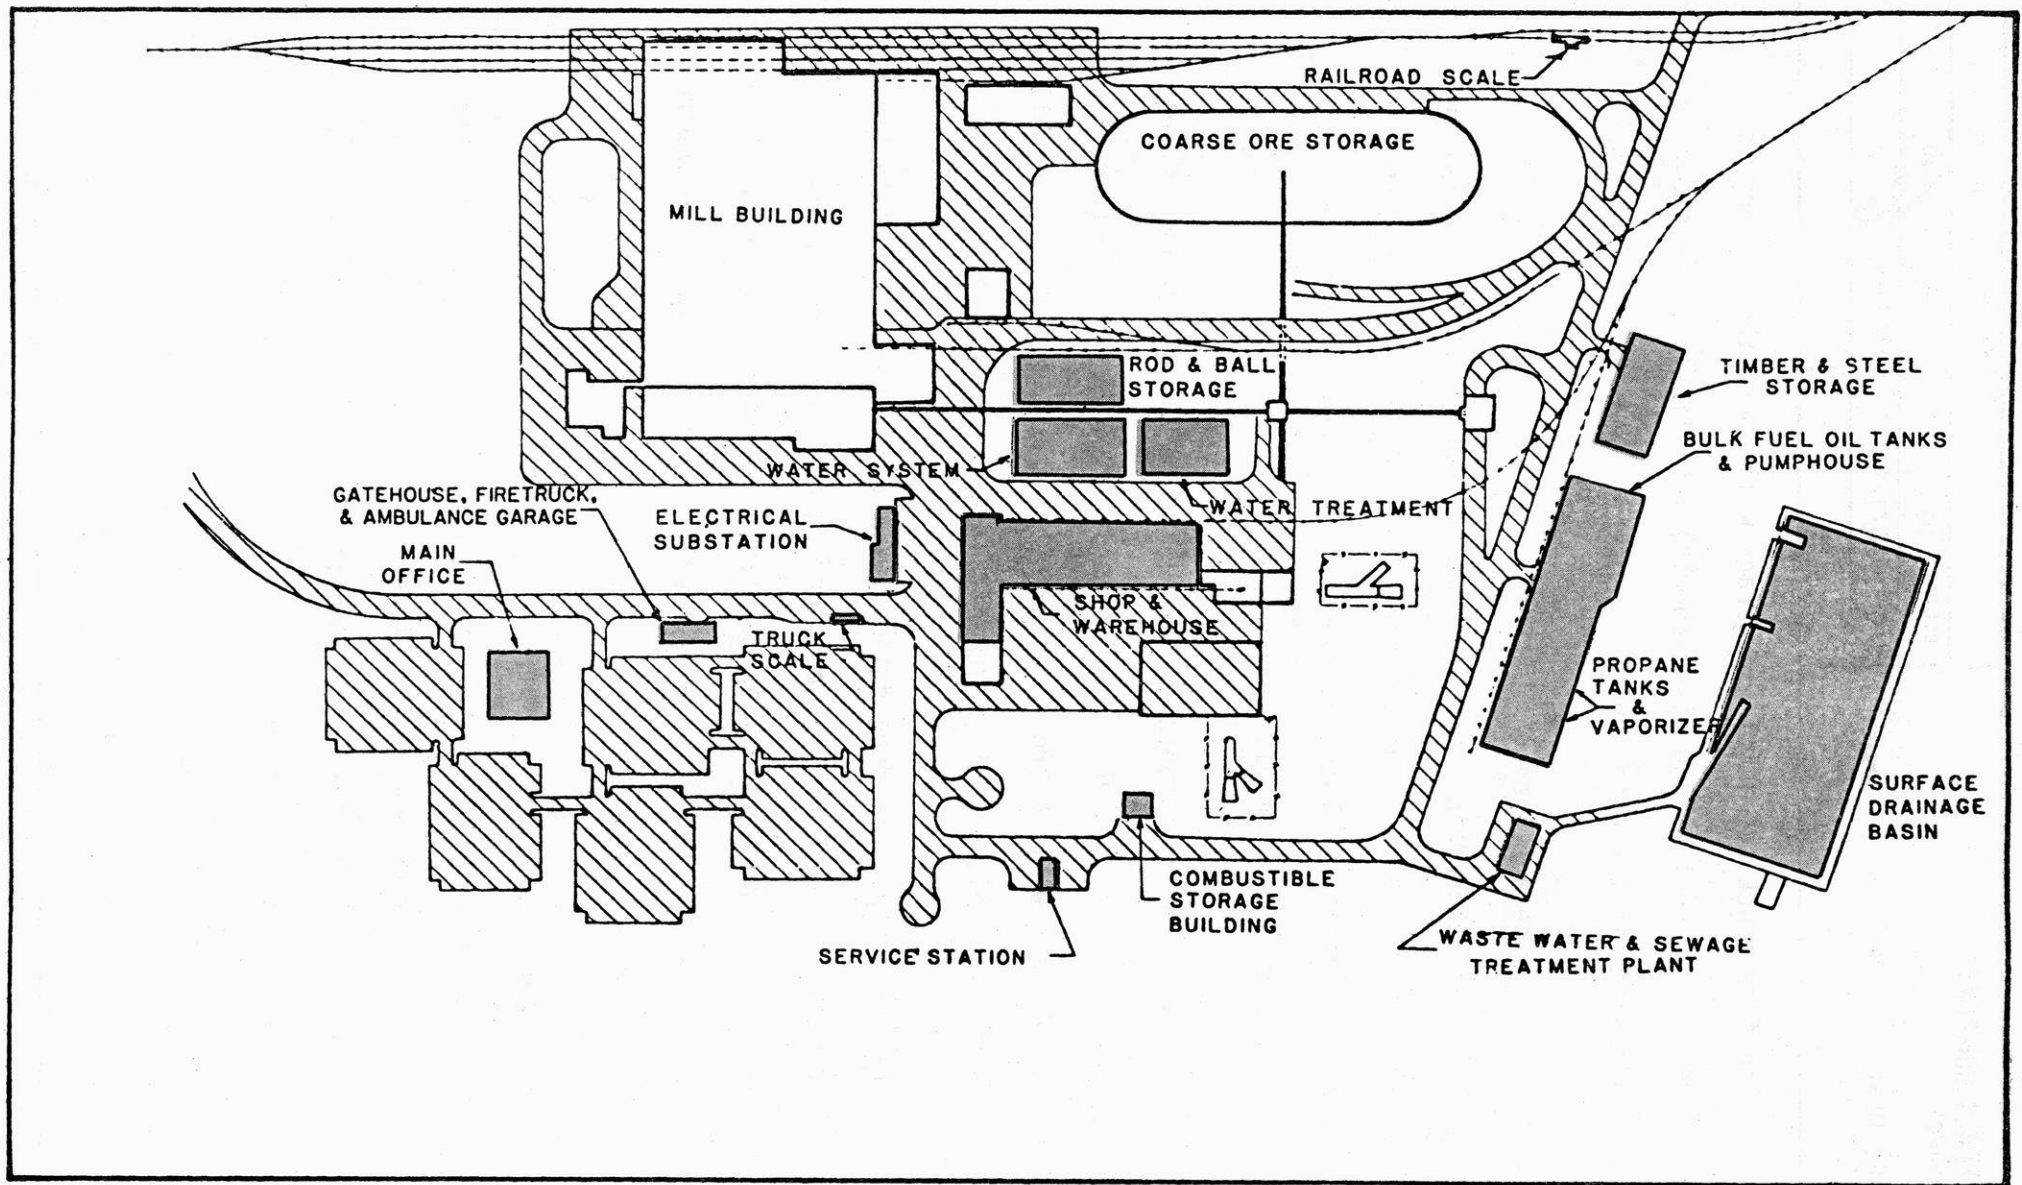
A schematic plan of proposed Crandon Mine/Mill facilities showing the ancillary facilities as shaded areas, and roads and parking lots, as cross-hatched areas.
